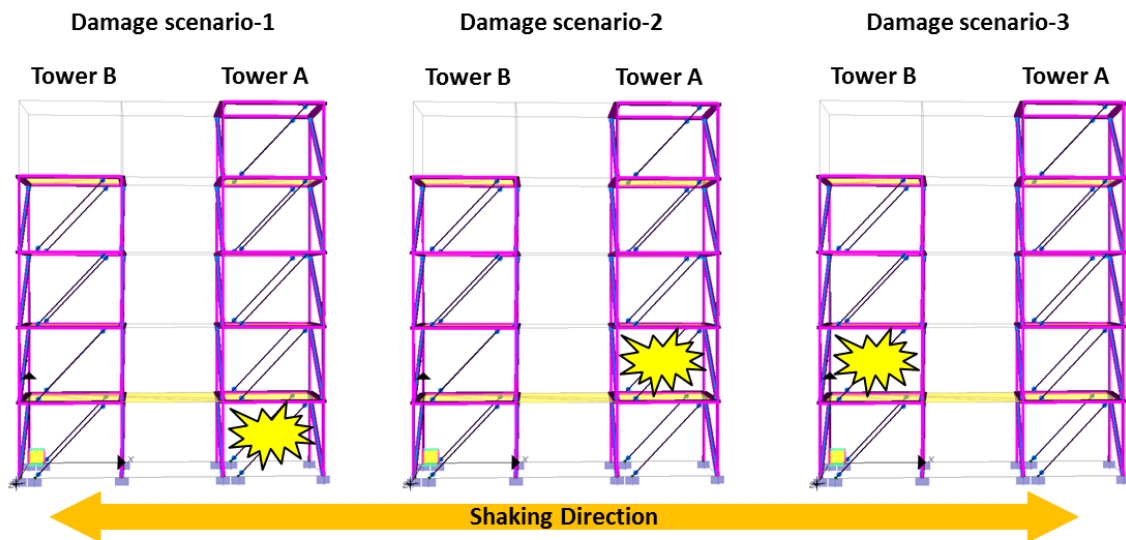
Damage scenario-1, 2, and 3 of the twin-tower steel structure
